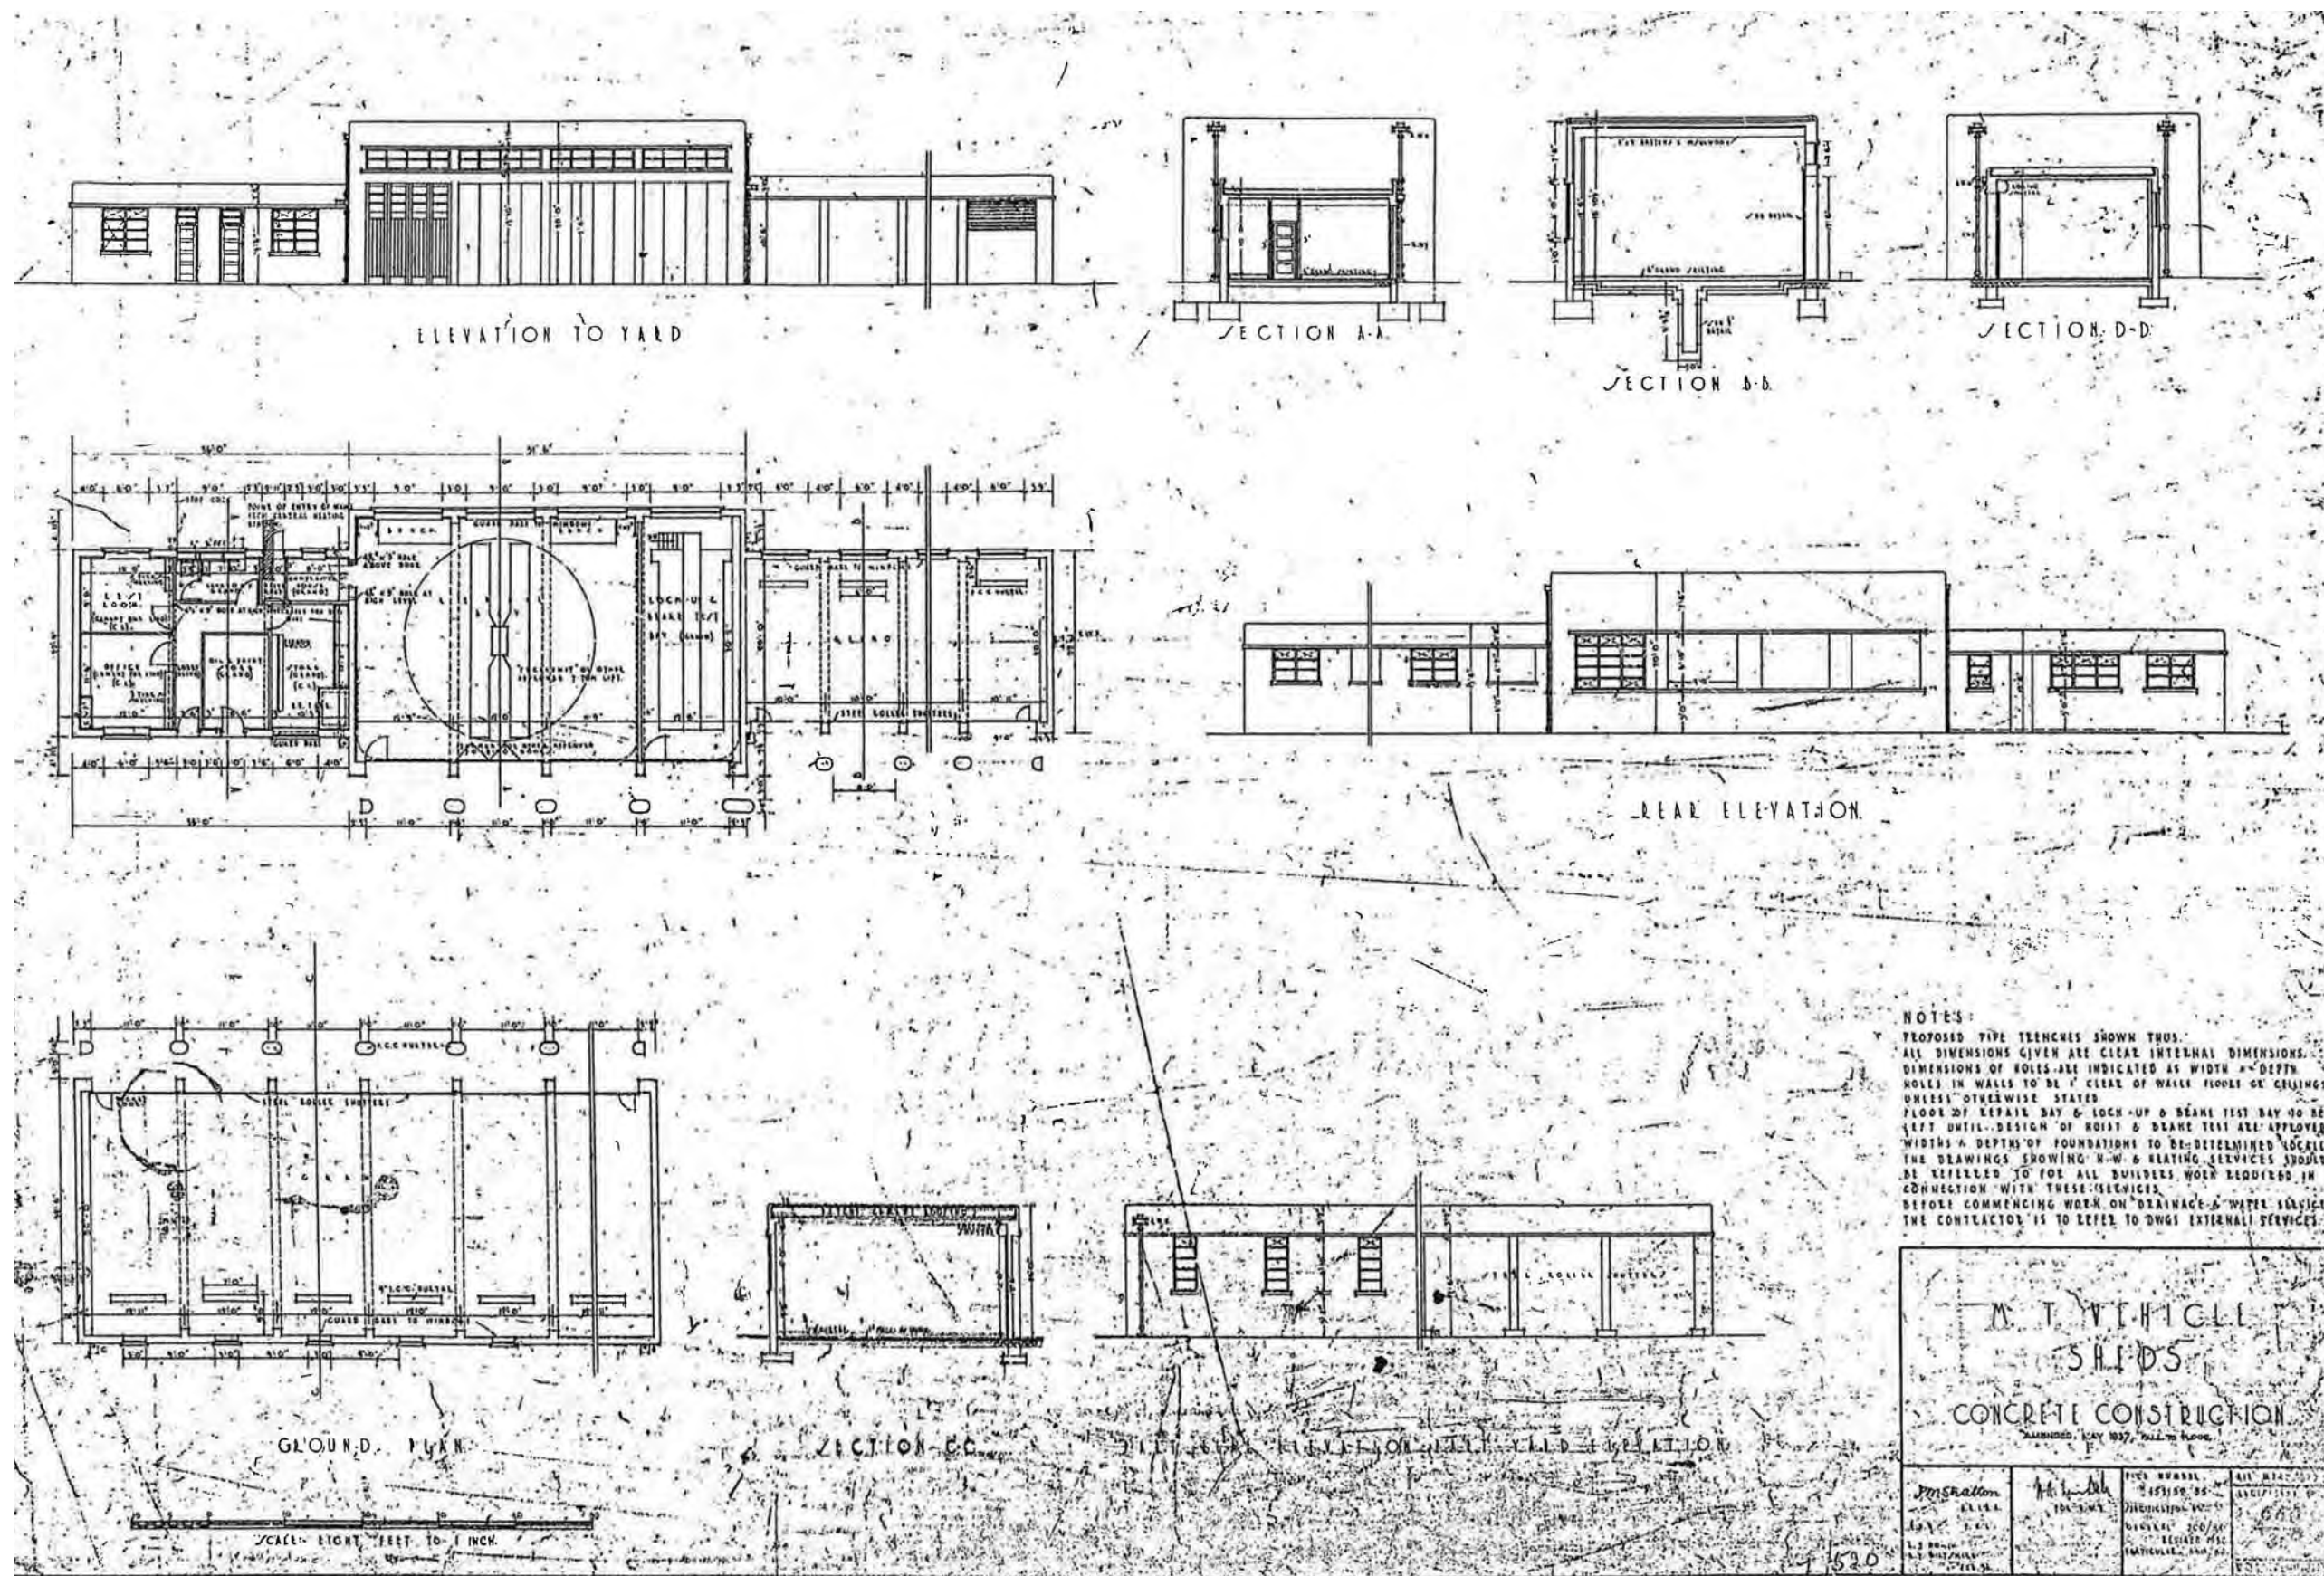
M.T vehicle sheds, plan and construction (revised 1937)
